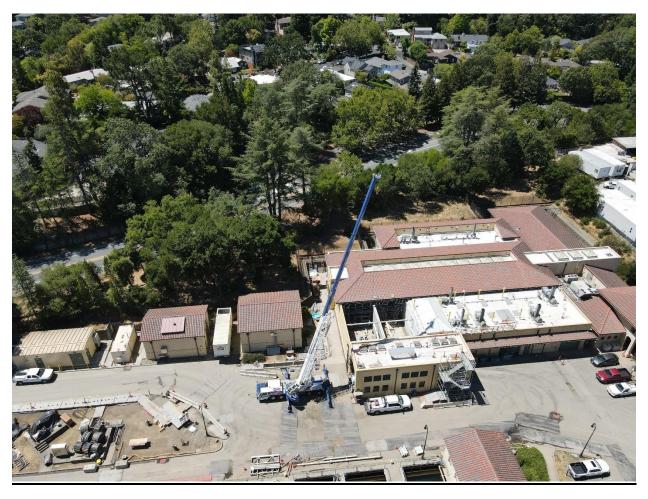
Crane lifting structural steel beams into openings in Chemical Building roof.
